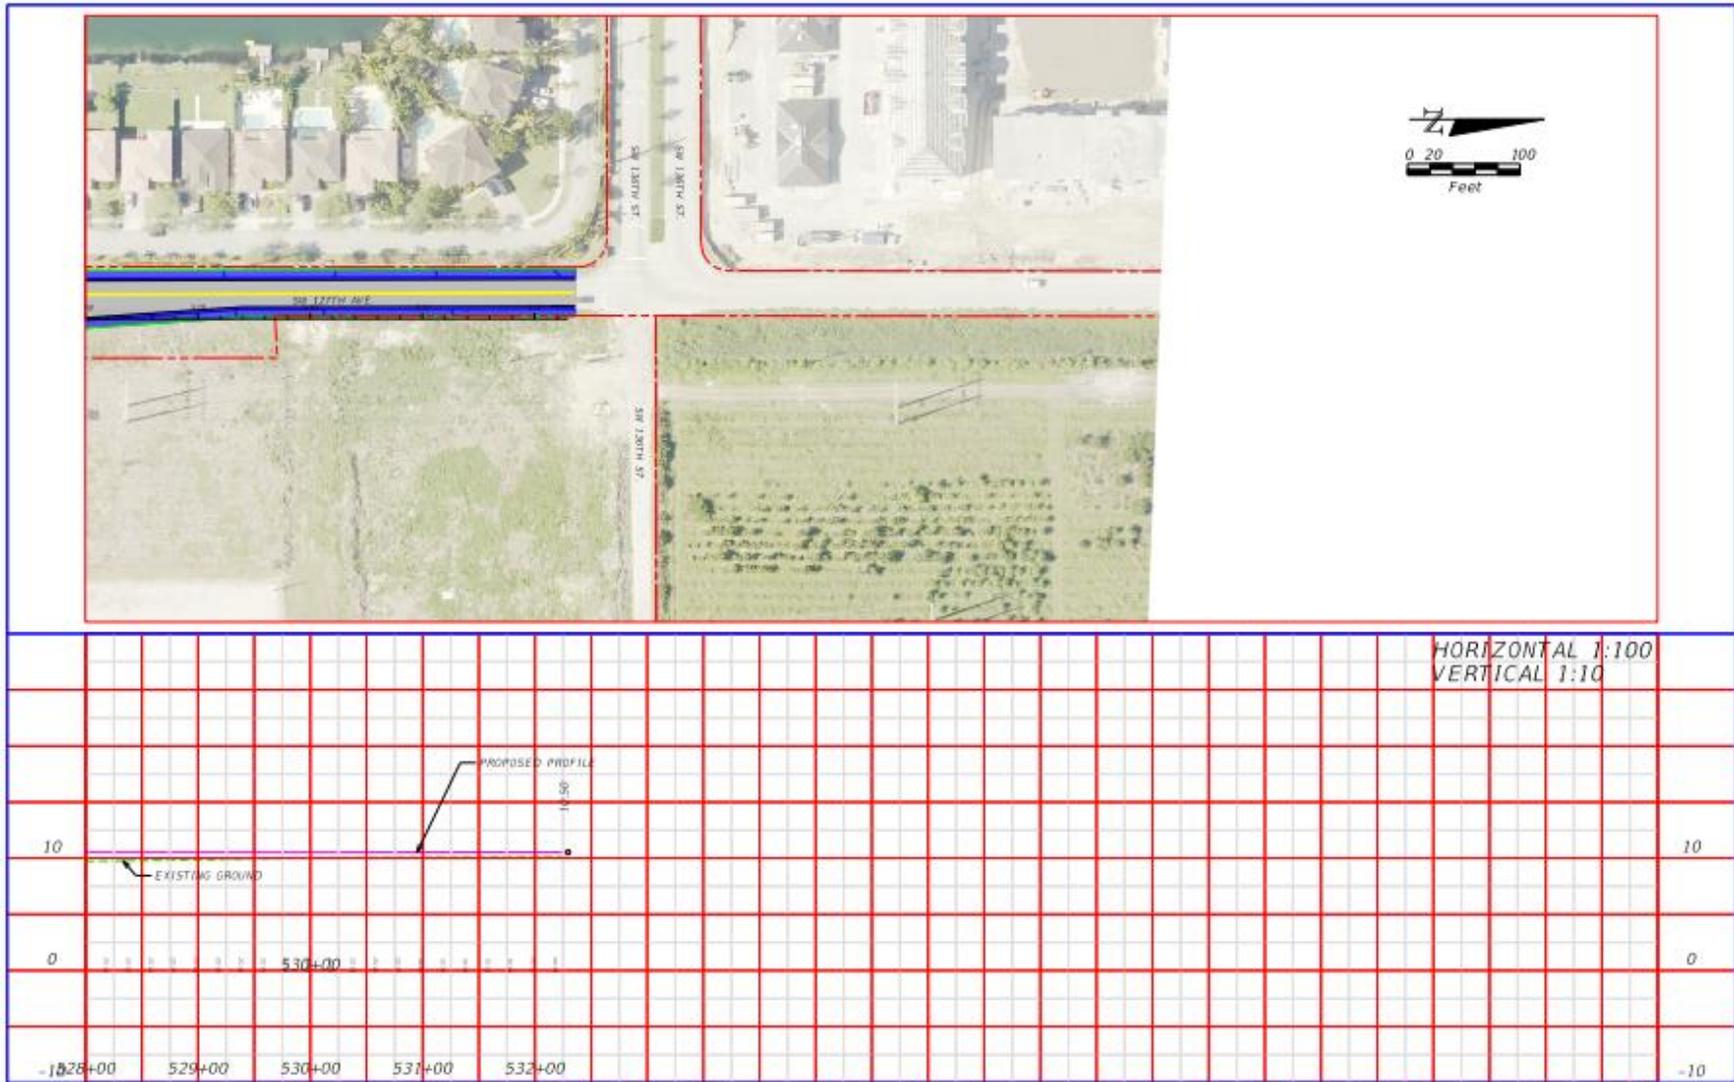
Alternative 3 – Overpass with 5% and 9% Grades (Section B) – Plan and Profile Views (Continued)
